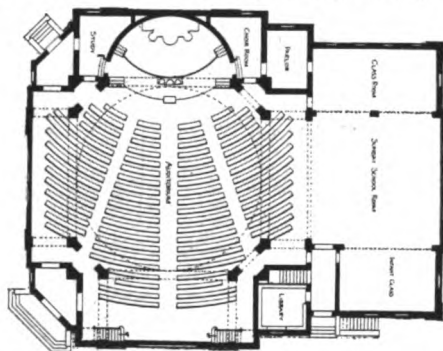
WEST PRESBYTERIAN CHURCH, BINGHAMTON, N. Y. COMPETITIVE DESIGN. GREEK CROSS AUDIENCE HALL PLAN. H. S. Gardner and A. B. Lawyer, Associate Architects.
